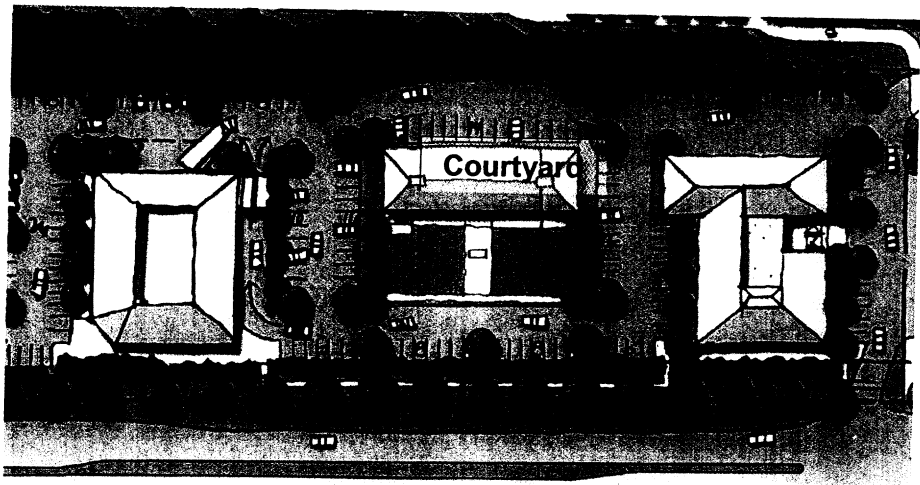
Typical parking lot design as it relates to courtyard building and landscape buffer.
